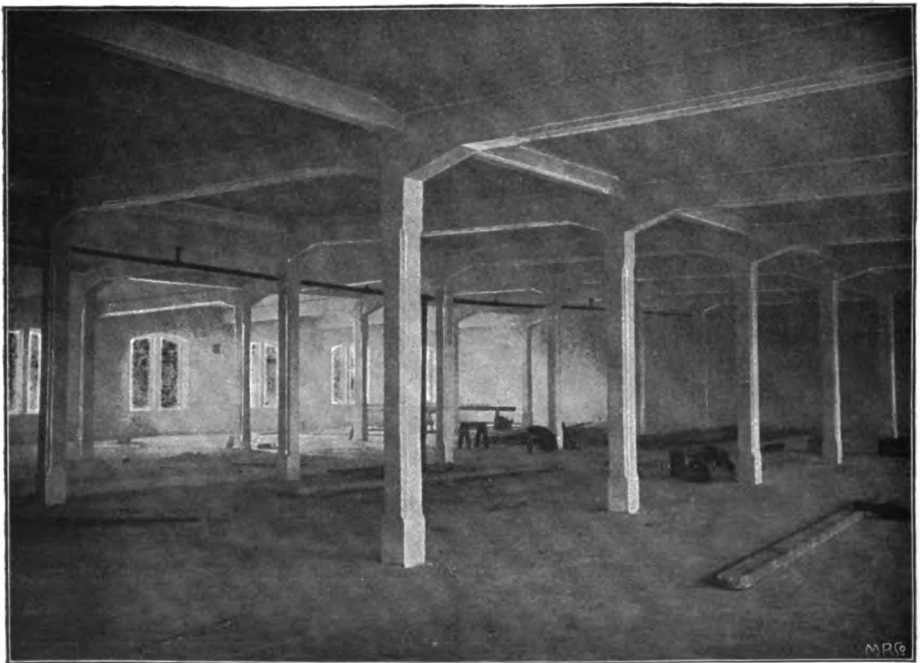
Spinning factory in Tammerfors (Finland), haunched floor slabs between girders, stiffening beams between the columns.
